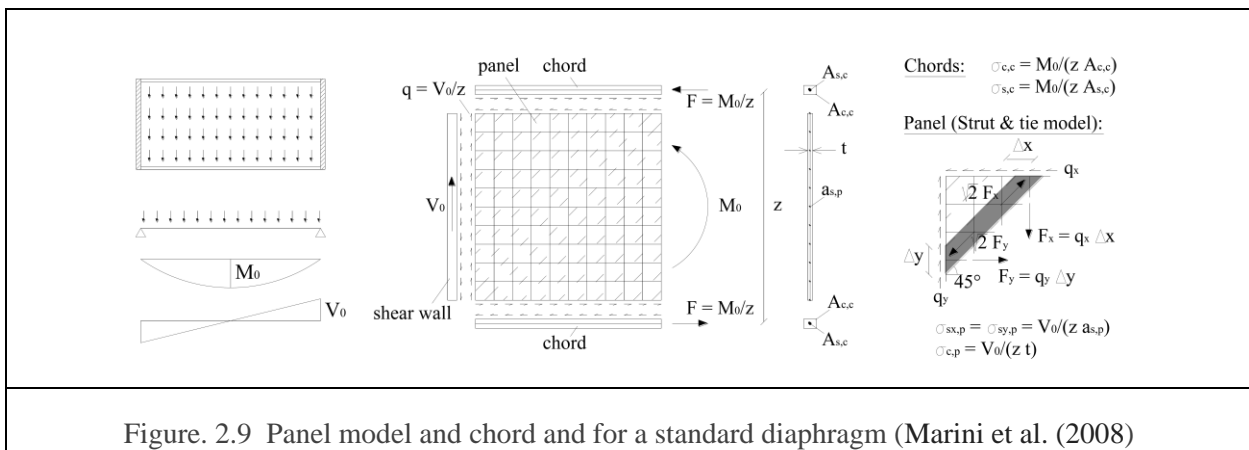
Panel model and chord and for a standard diaphragm (Marini et al. (2008))
